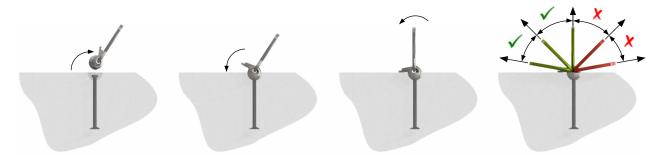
Connection detail of KKL Lifting Key and KK Lifting Insert without safety pin.
